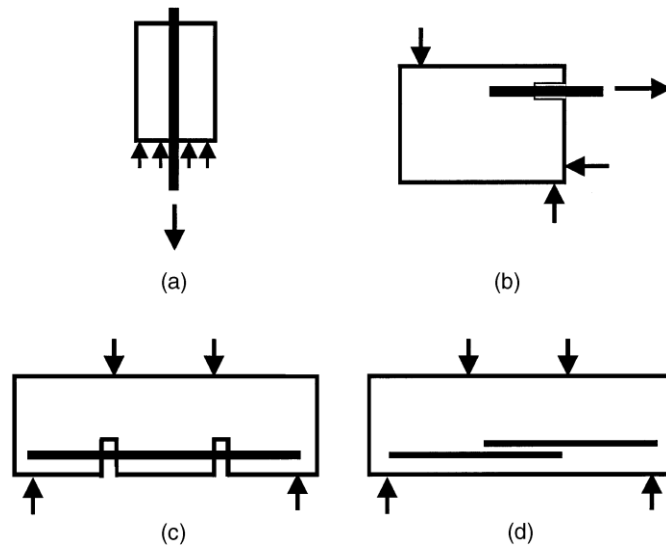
Schematic of: (a) pullout specimen; (b) beam end specimen; (c) beam anchorage specimen; and (d) splice specimen. [7]
